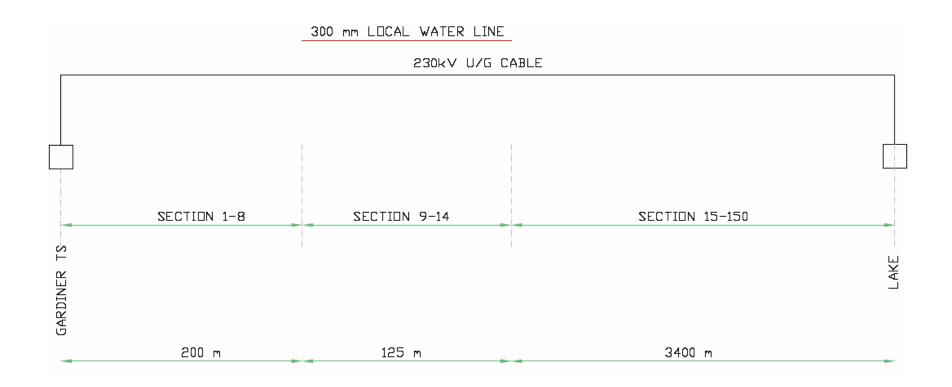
Cable Sections with 300 mm Local Water Pipeline
